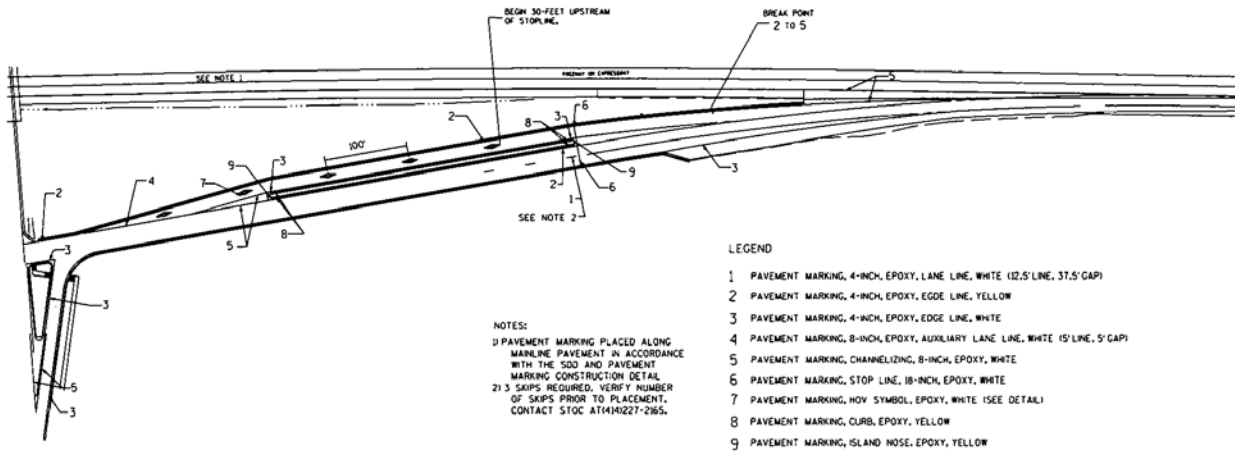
Typical Ramp Meter and HOV Lane Marking
